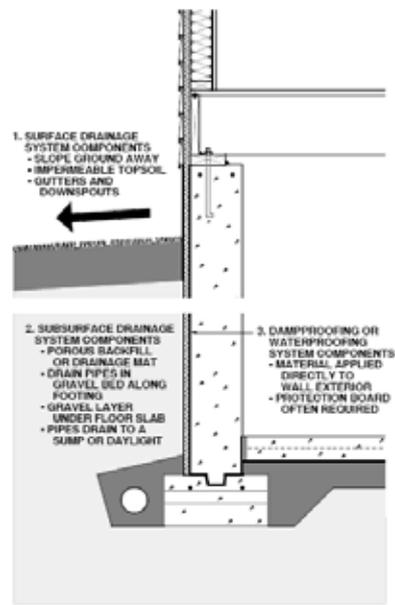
Components of Basement Drainage and Waterproofing Systems
